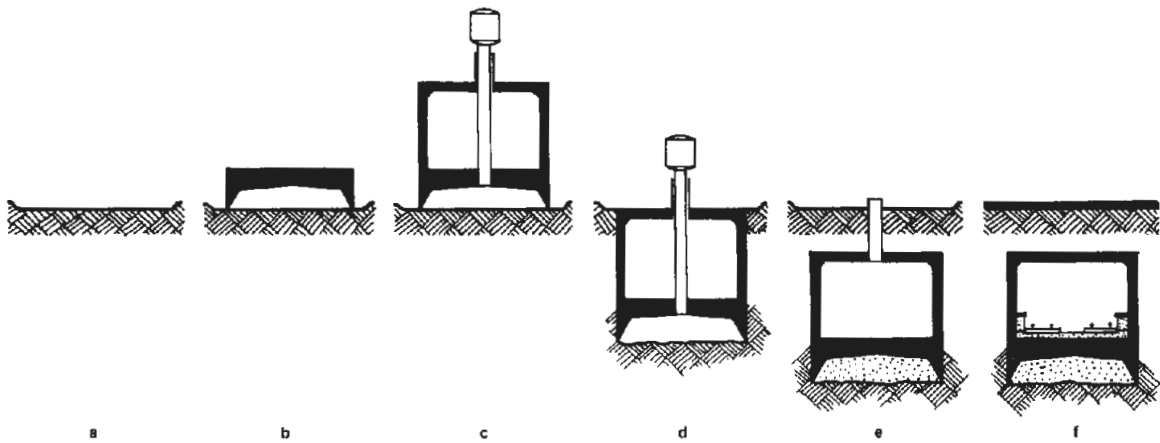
Construction procedures of the "sunken tube" section on the Amsterdam Metro. (Courtesy Civil Engineering magazine.)
